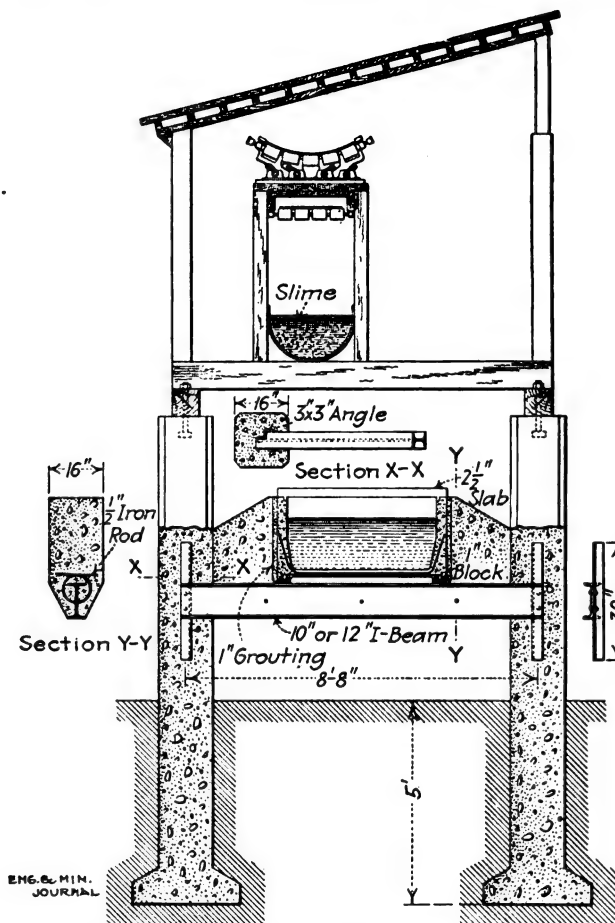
SUPPORTING THE ERECTED LAUNDER.
